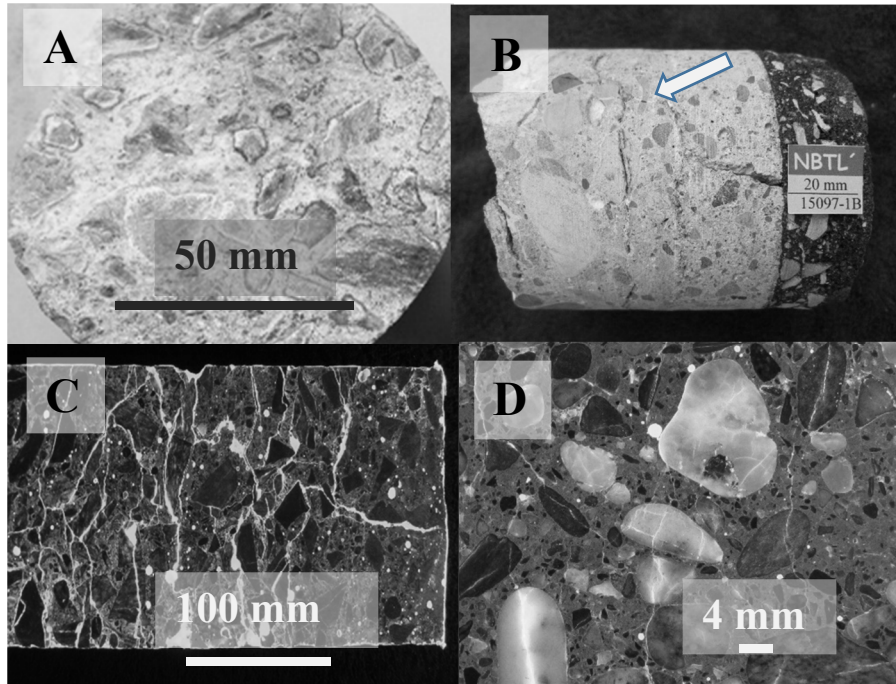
Norwegian structures. A: white reaction rims in aggregates on a broken face of a concrete. B: concrete core from a bridge pavement heavily cracked by ASR. Note that the bitumen cover has not prevented ASR. Arrow shows crack in a reacted aggregate. C: high intensity of surface parallel cracks in a bridge pavement (in fluorescence light). D: cracks in aggregates, cracks from aggregates running out in the cement paste and cracks in the cement paste (in fluorescence light).
